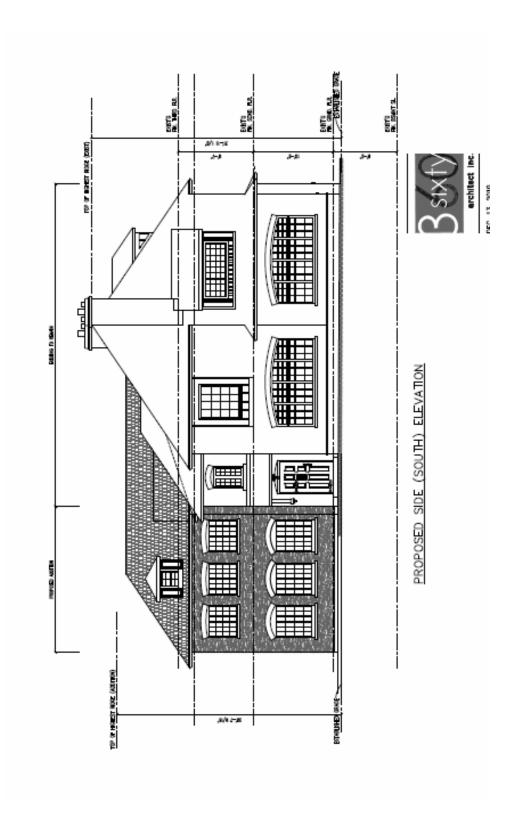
Proposed side or south elevation of 1341 Stavebank Road. (image from owners.)
